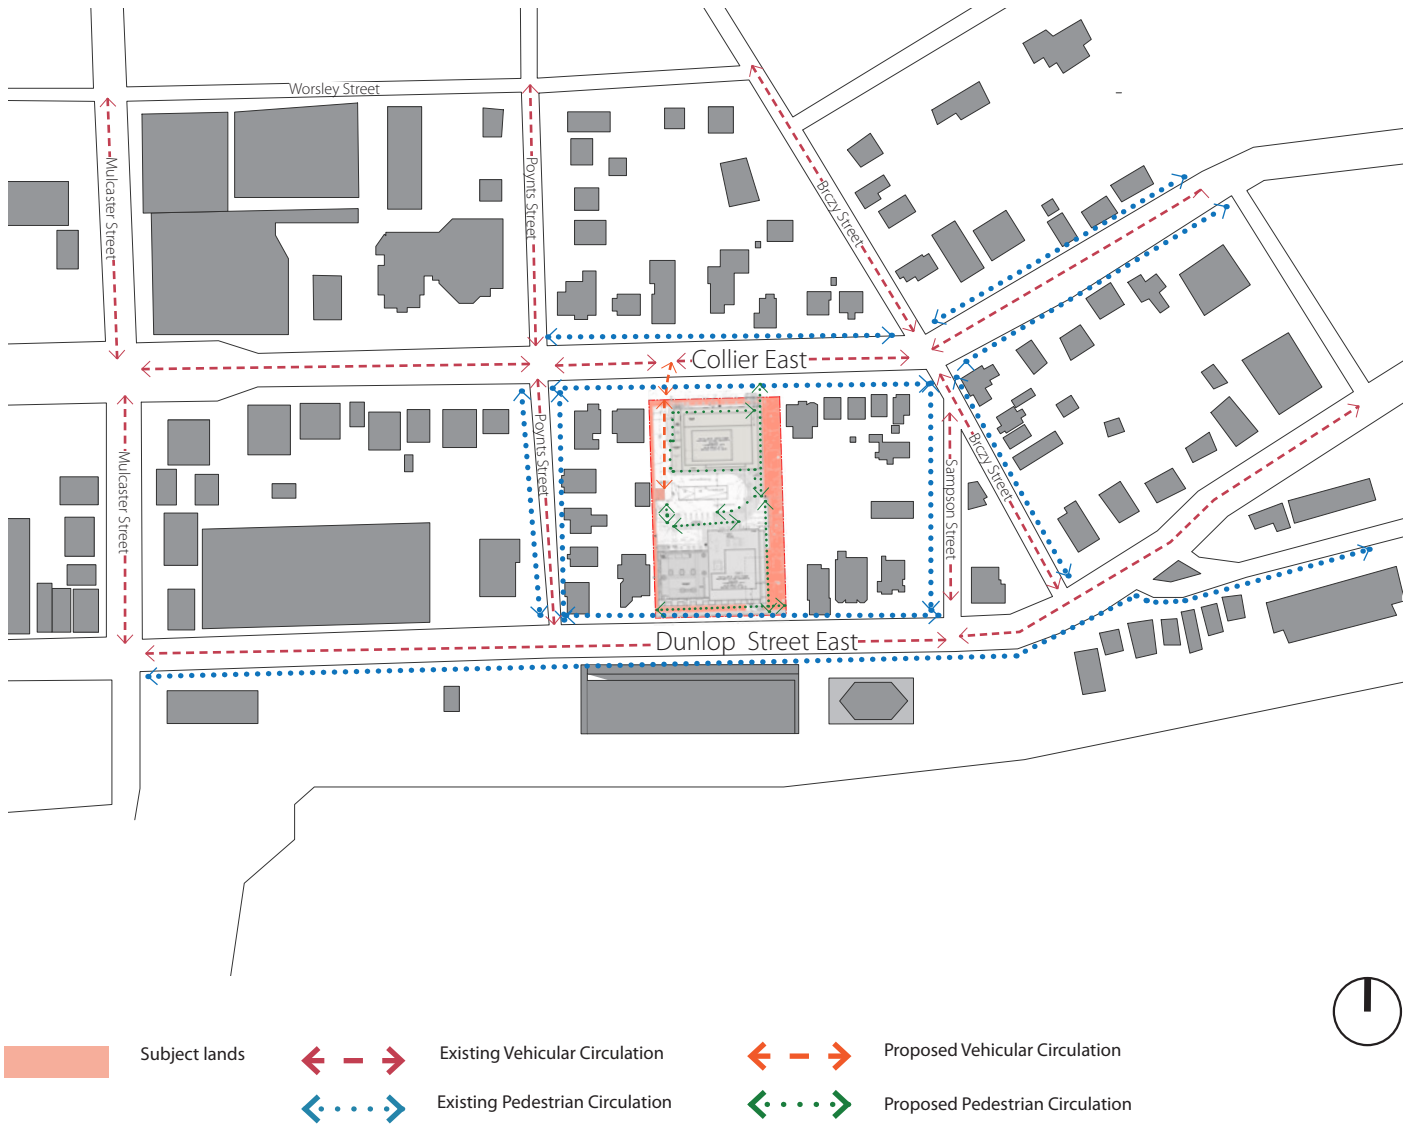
Context Plan, Vehicular and Pedestrian circulation.
